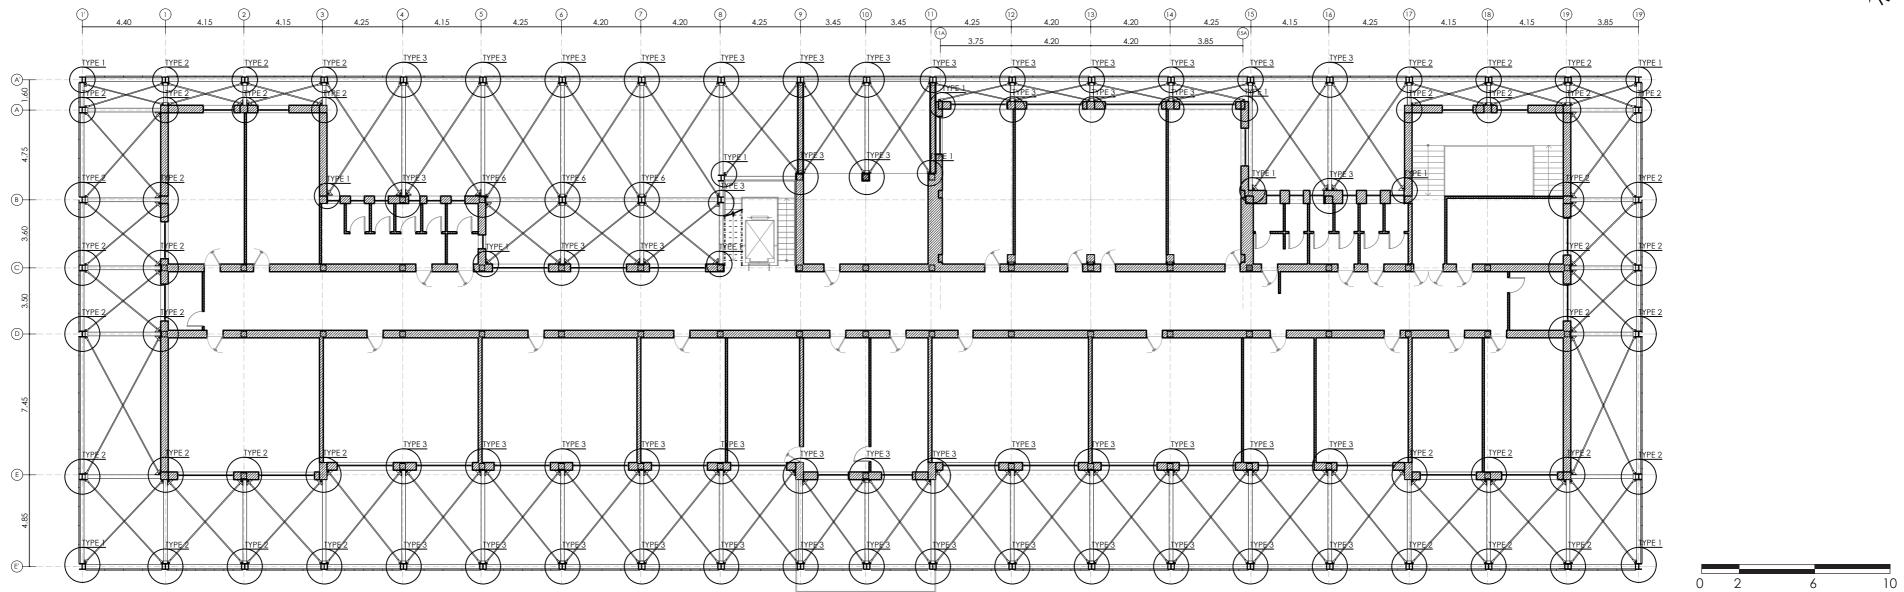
Typical Floor Plan Navigator Typology of Connections | Scale 1:200
